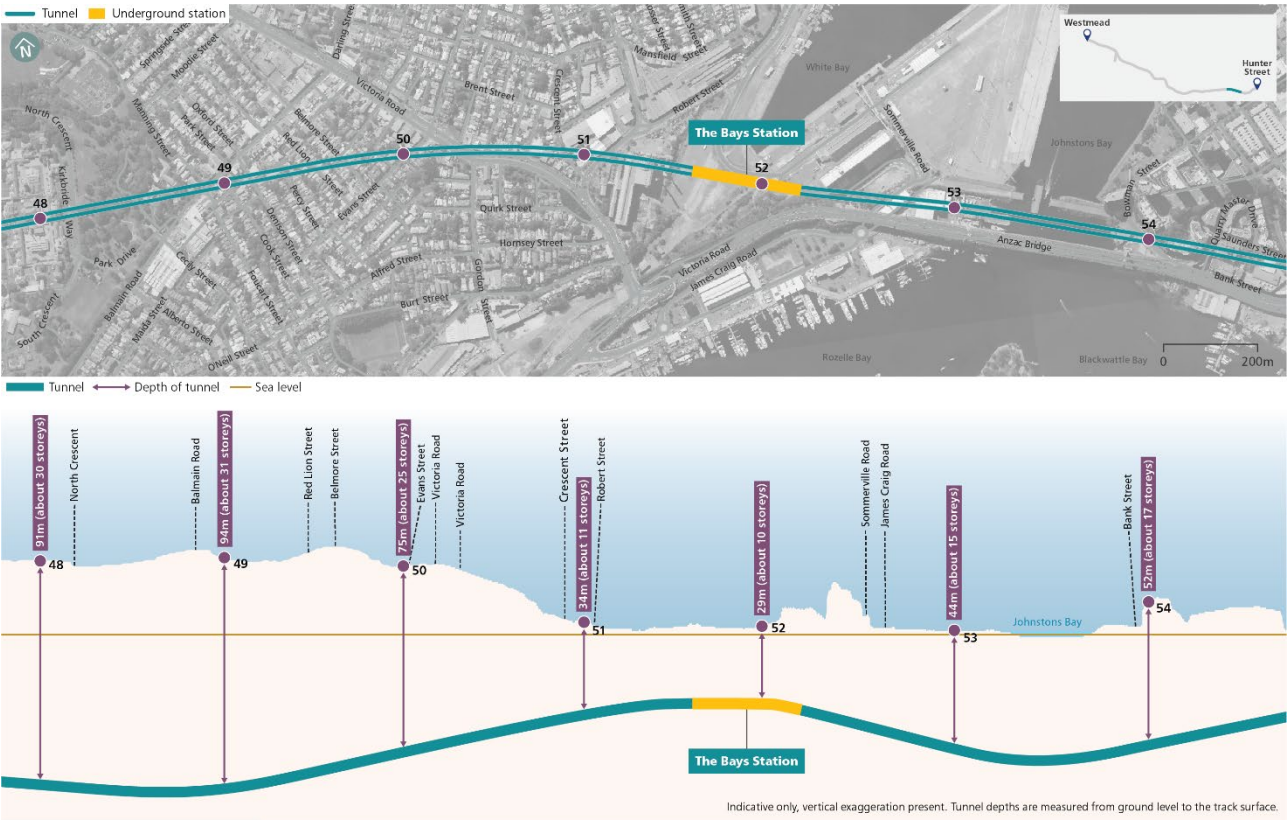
Indicative alignment plan and long section (7 of 8)
